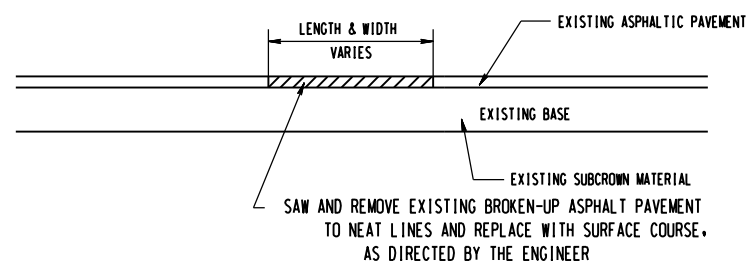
DETAILS OF REPAIRING EXISTING PAVEMENT PRIOR TO RESURFACING FOR FULL DEPTH AND MILLING
